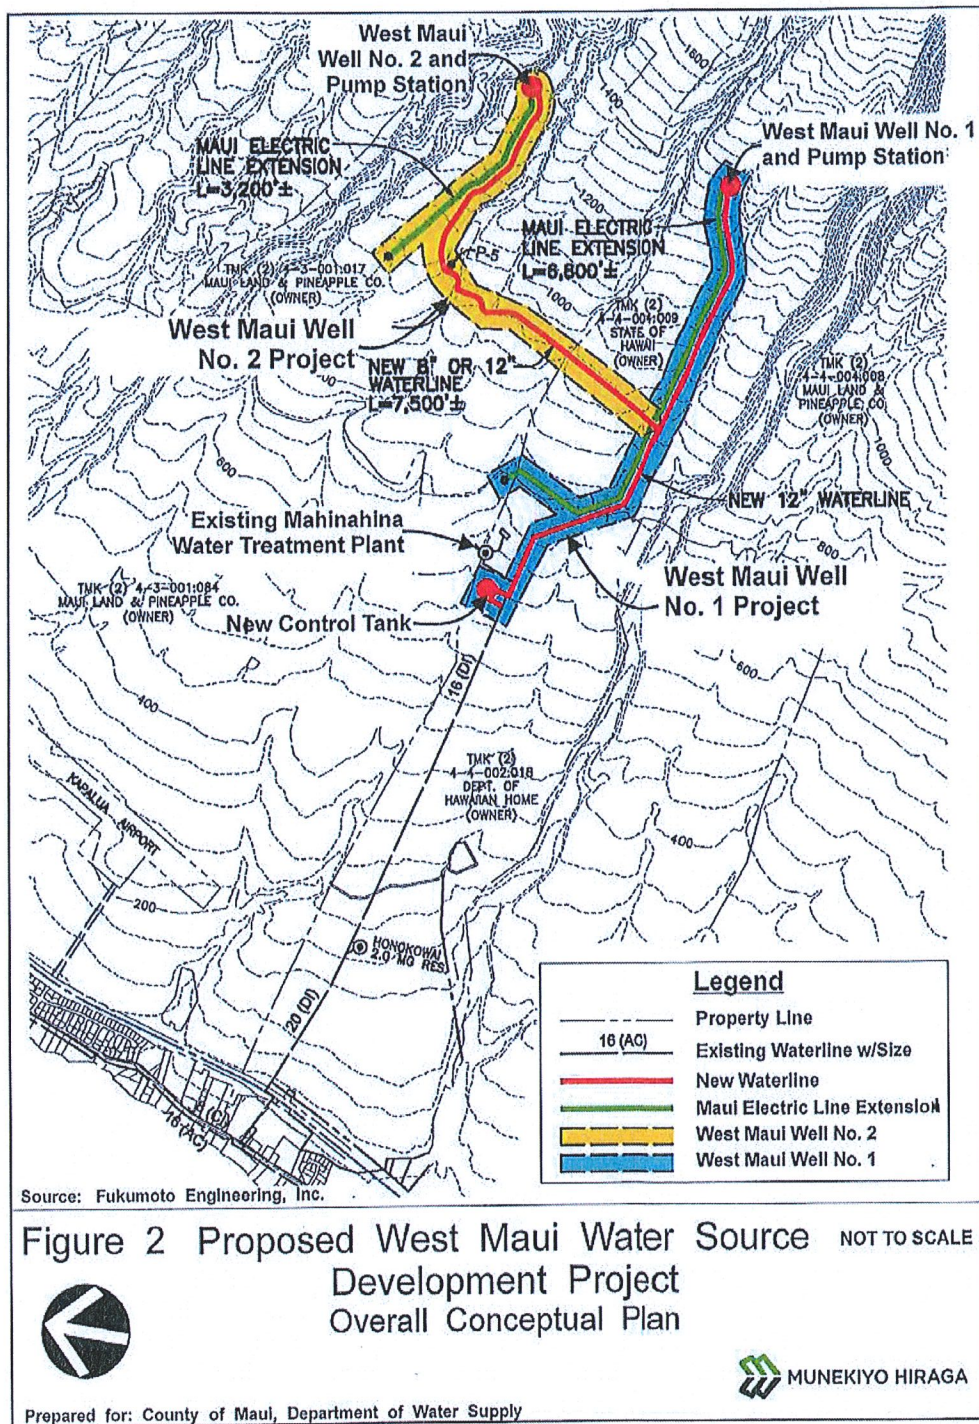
The Proposed West Maui Water Source Development Project Overall Conceptual Plan (Munekiyo Hiraga 2018).
